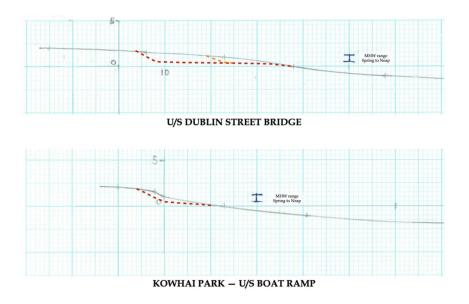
Potential bank re-profiling at u/s Dublin Street bridge and Kowhai Park sites.
